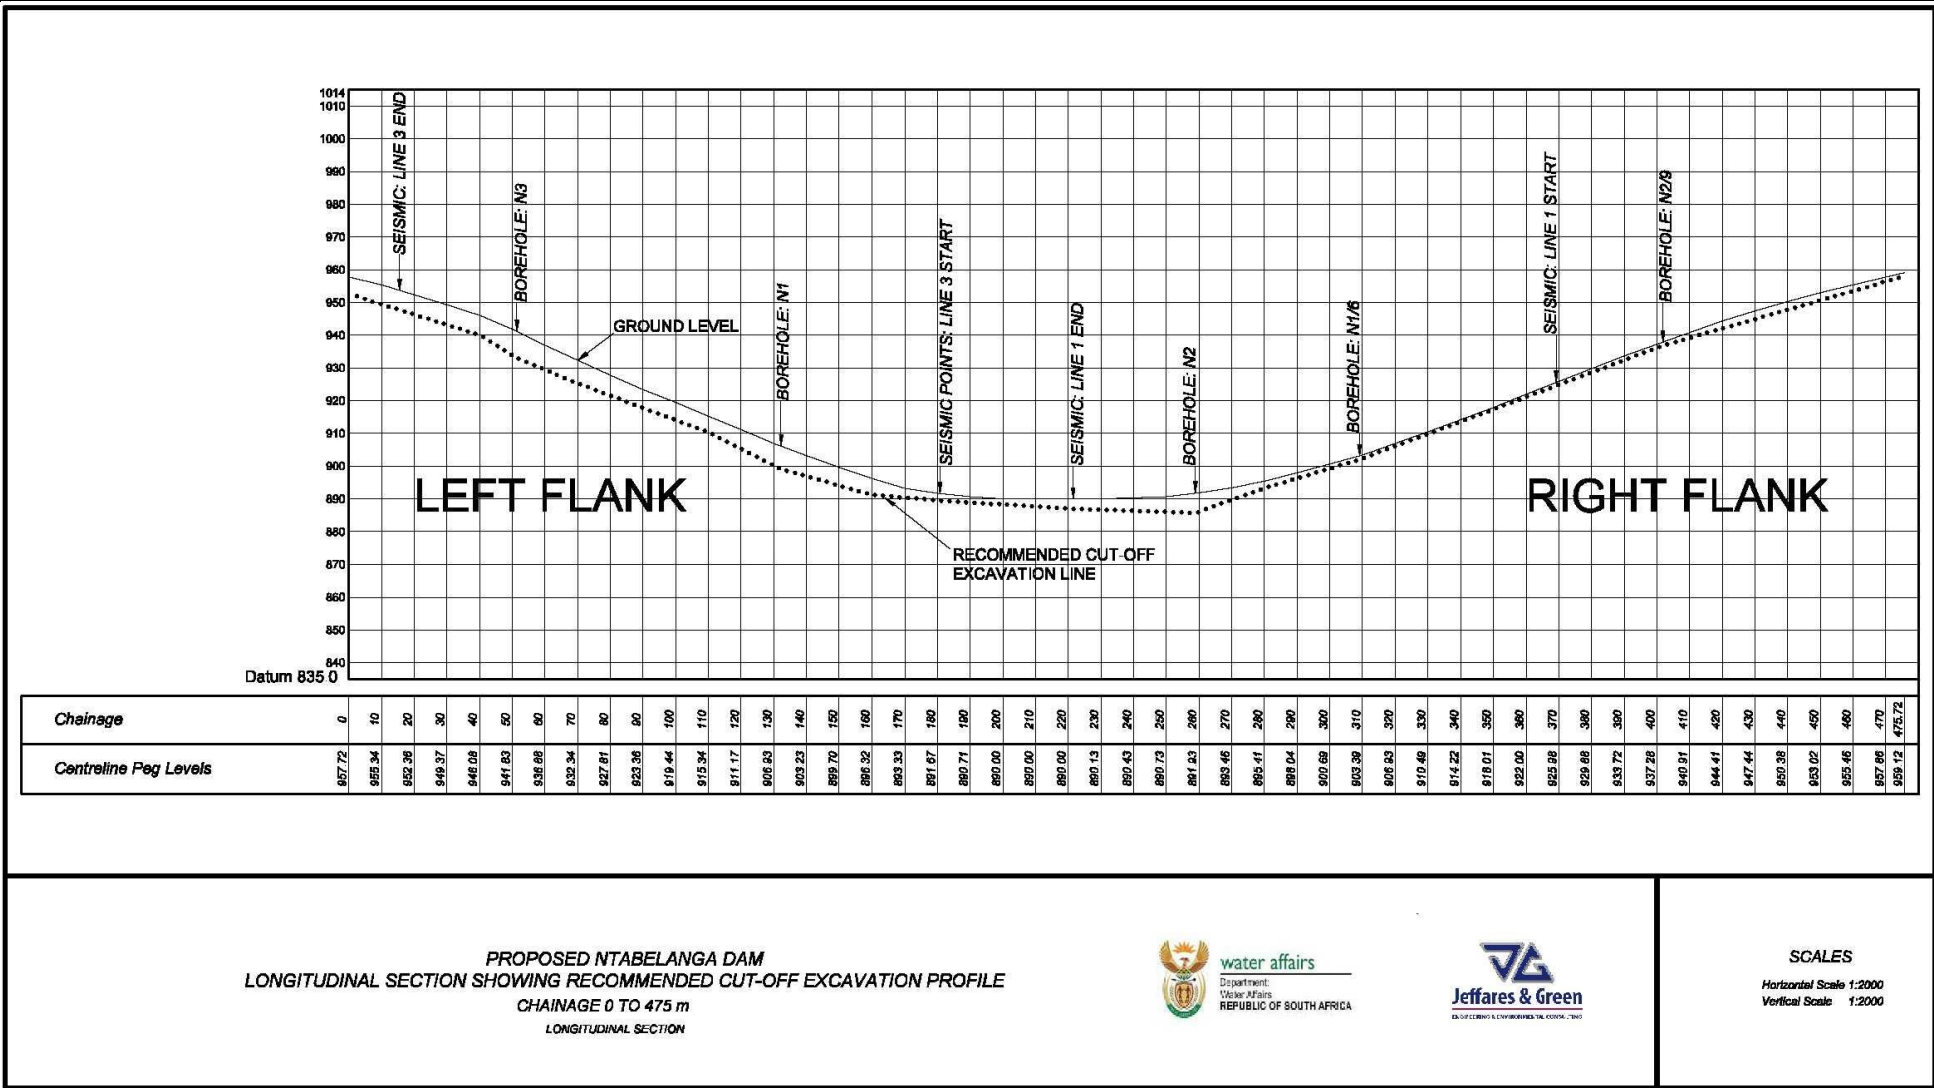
LS - Recommended Cut-Off Excavation Profile
